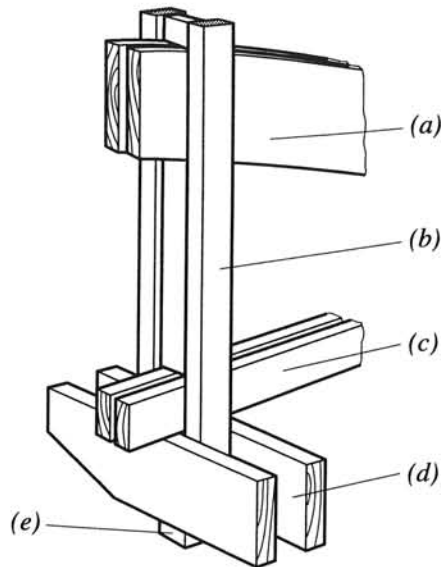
Cross girder with hanger. (a) Spruce glulam arch, (b) beech glulam hanger, (c) spruce glulam tension tie, (d) beech glulam cross girder, (e) steel fitting for cross girder support.
